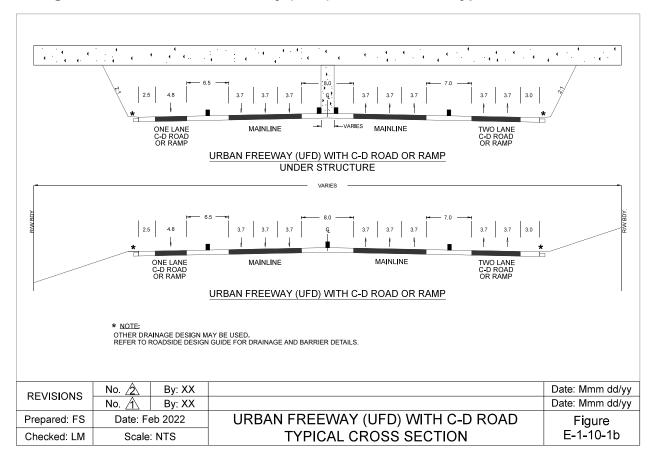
Urban Freeway (UFD) with C-D Road Typical Cross Section
